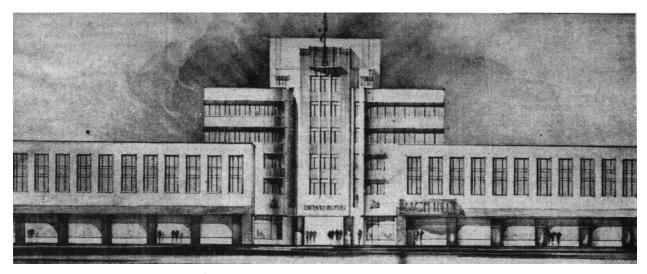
Rendering of Mercantile Bank Building, 420 Lincoln Road., Miami Beach, 1940. (Miami News, 5/12/1940, p. 30)
